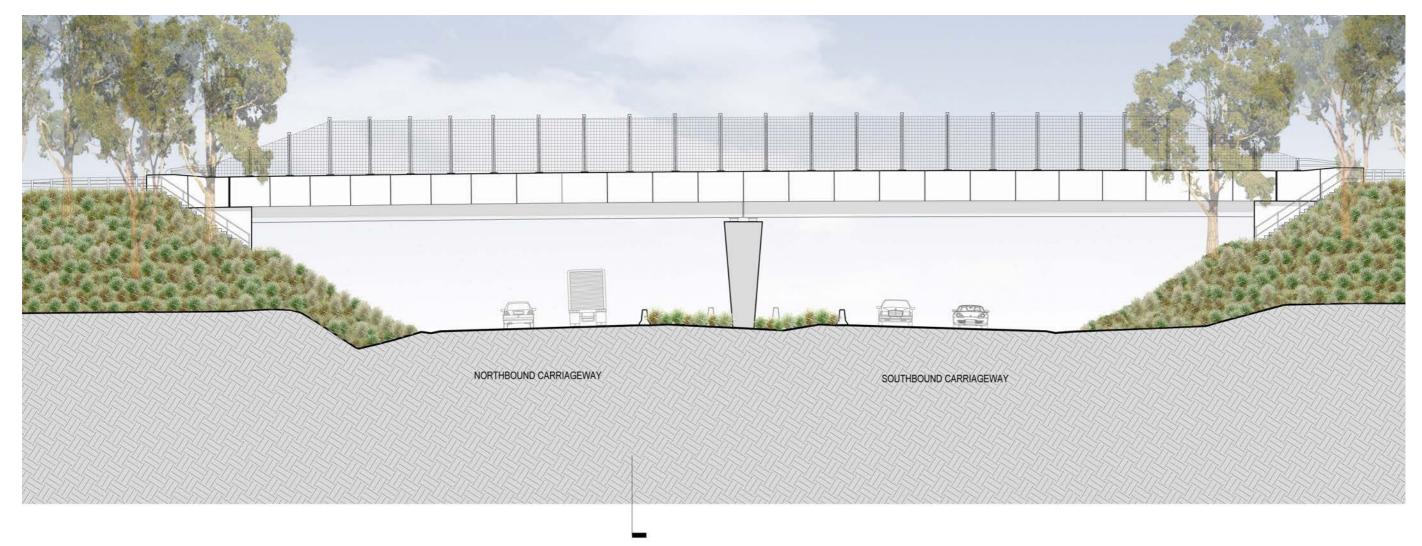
Bridge over Pacific Highway at Kundabung Road: Elevation
